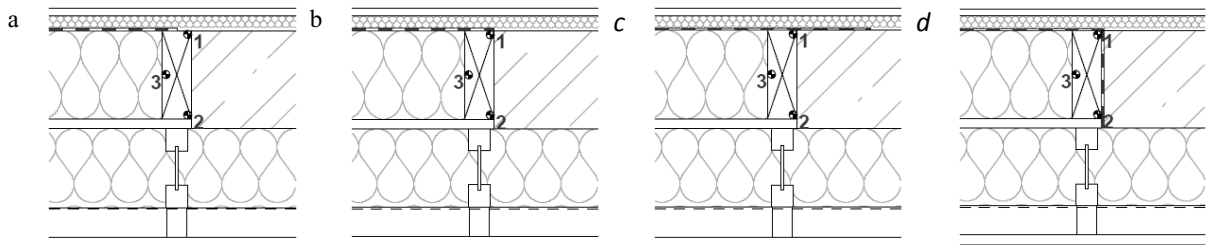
(a) Termination of vapor barrier on a wooden pillar system "Two would" Four " (b) Termination of vapor barrier at the contact of a wooden pillar system of " Two by Four "and the pillar concrete skeleton (c) Termination of vapor barrier on the pillar of concrete skeleton (d) Location vapor barrier between the components' Two by Four "and reinforced concrete frame.
